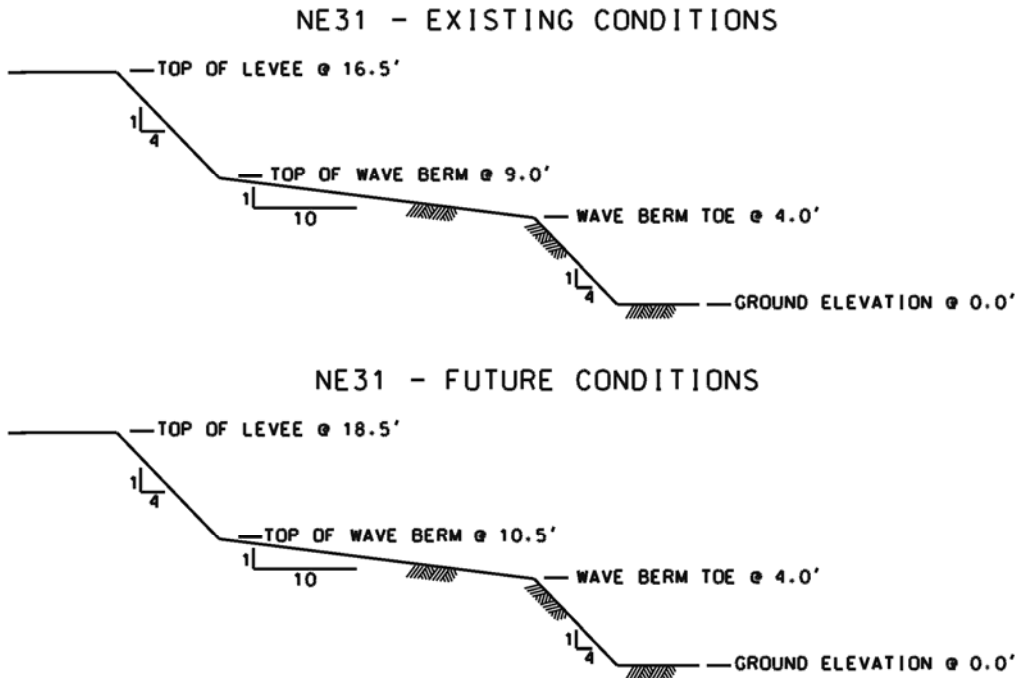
Cross-section profile for transition levee between New Orleans East Lakefront levee and the South Point to US Highway 90 (NE31) for existing (upper panel) and future conditions (lower panel).
